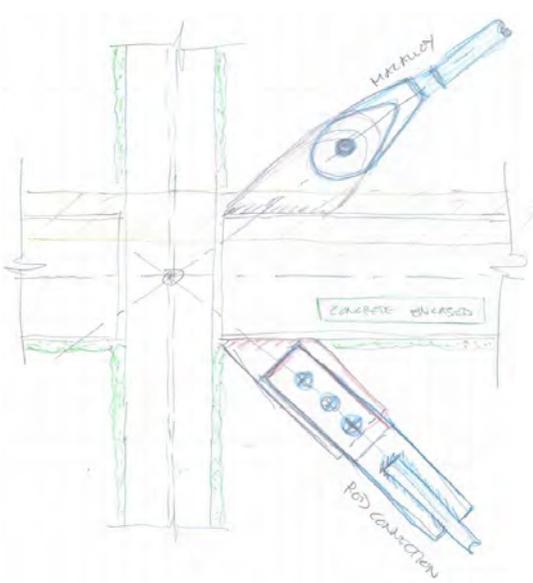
Option for connection of rod cross-bracing at beam-column connection
